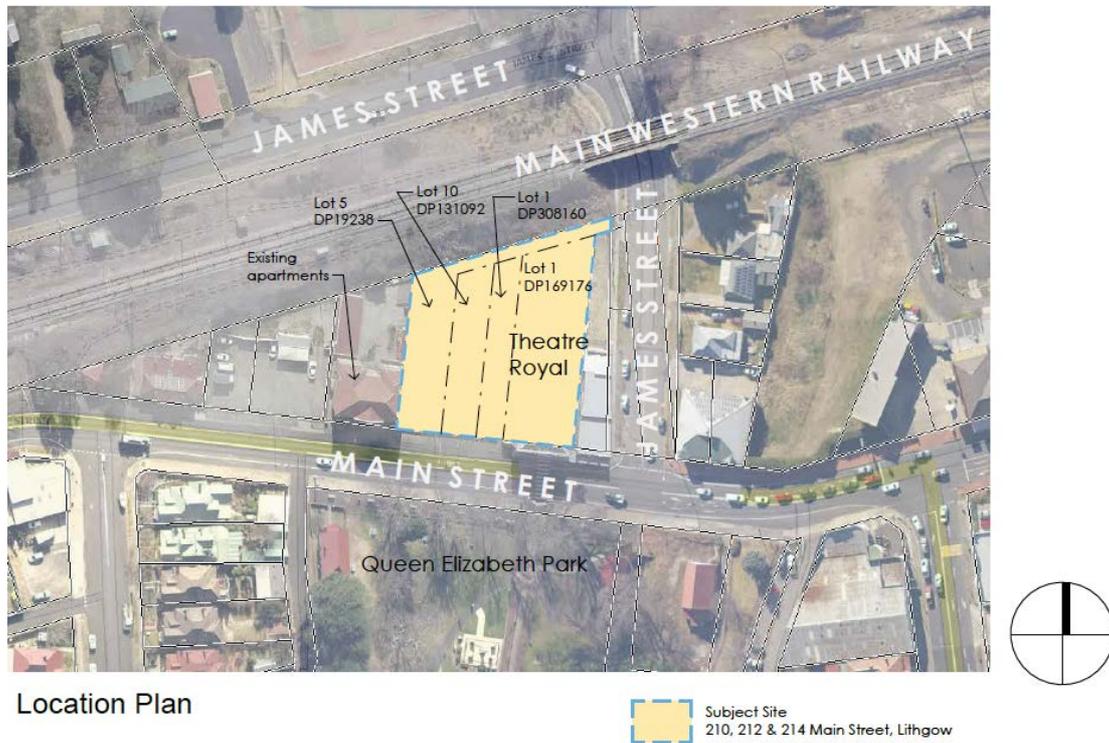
Location Plan. (HavenhallandMatheer Concept Plan SK.00)
